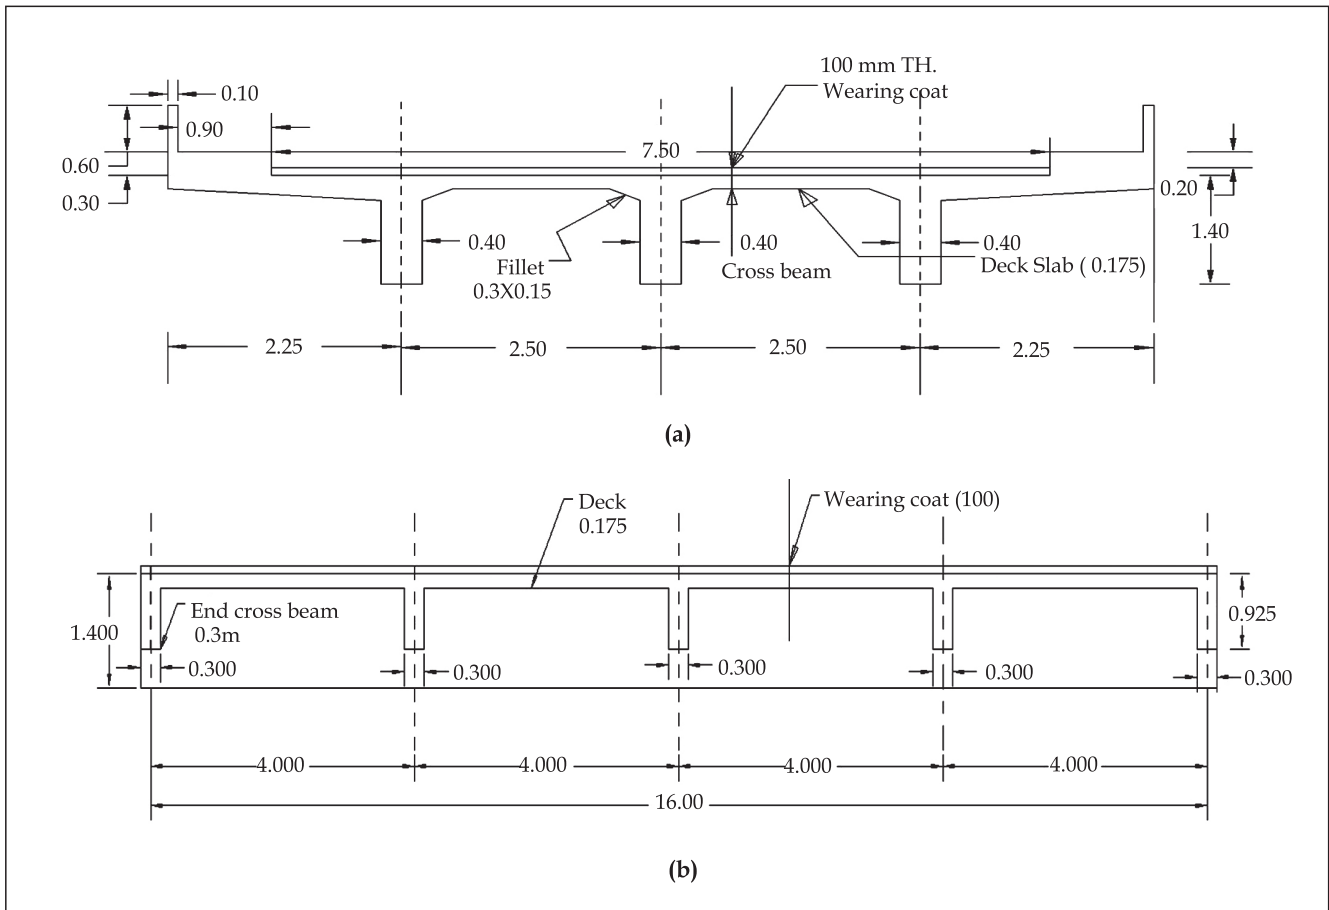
(a) Bridge cross section (b) Longitudinal section of bridge
